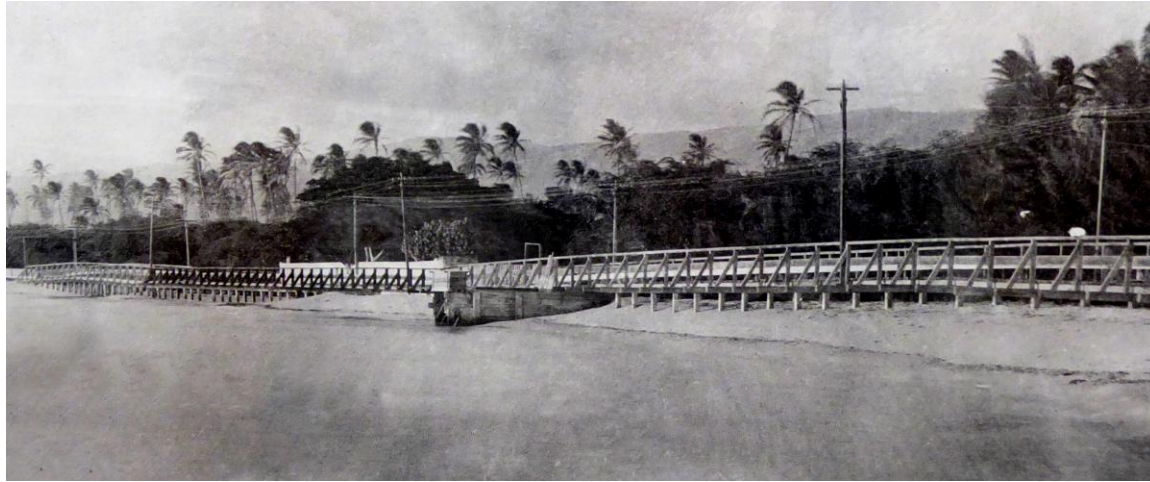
Bridge/causeway at the entrance to the new Kapi‘olani Park, around 1880, view to northeast. Hawai‘i State Archives (PP115-11-006).
